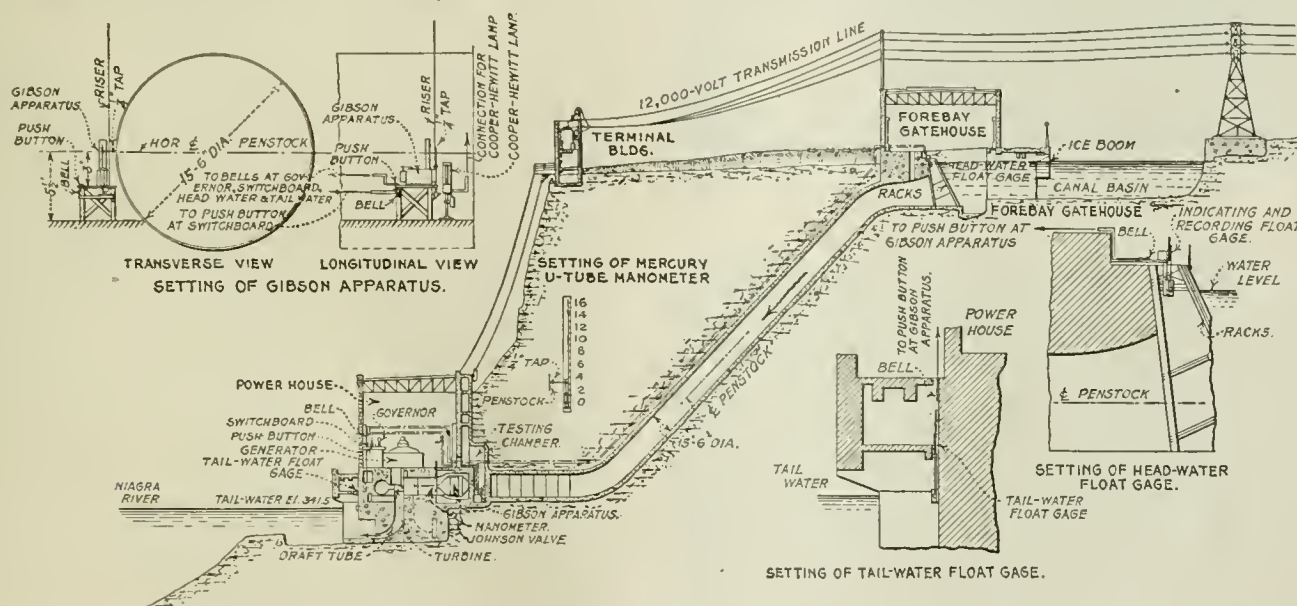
CROSS-SECTION OF TYPICAL HYDROELECTRIC POWER PLANT SHOWING LOCATION AND SETTING OF APPARATUS AND EQUIPMENT FOR EFFICIENCY TESTS
